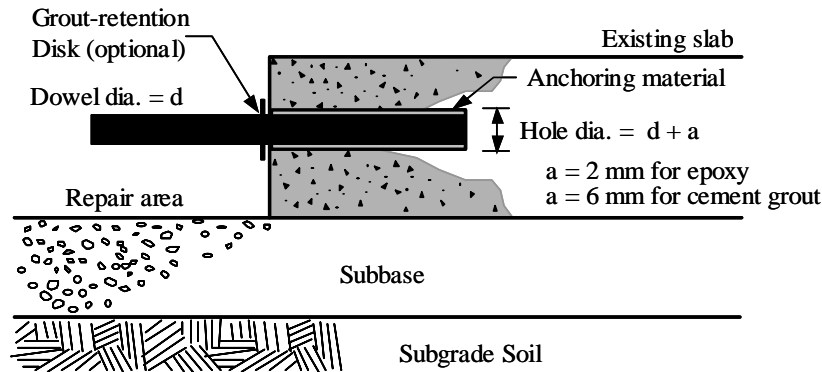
Dowel bar anchoring in slab face (FHWA, 2001)
